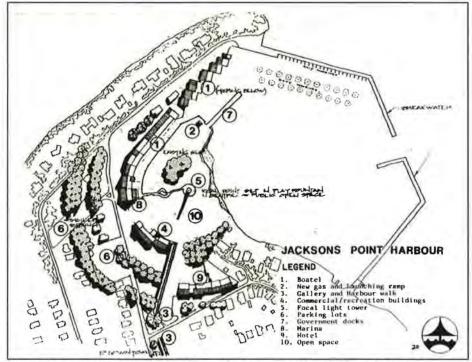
Jackson's Point CAUSE Plan - Harbour Plan (Ontario Association of Architects)
